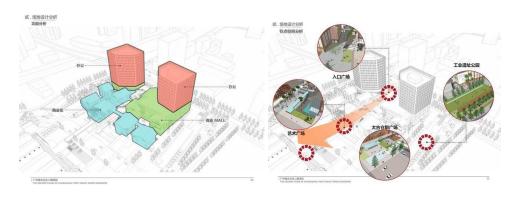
Plans of the Second Phase Renewal Project (Source:
